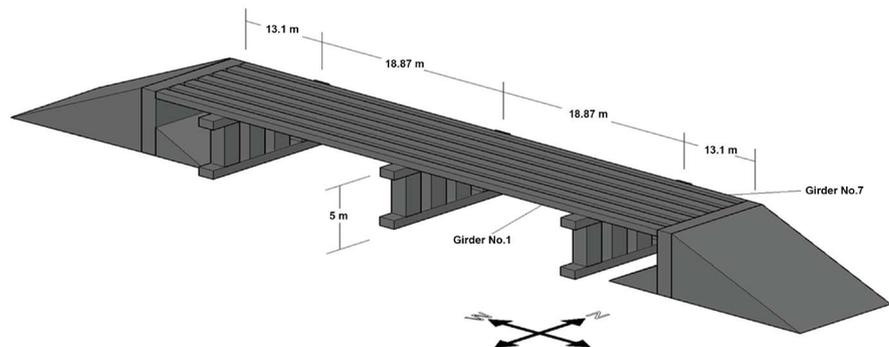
Drawing of Unayza-Petra Bridge at AL-Hossaina.
